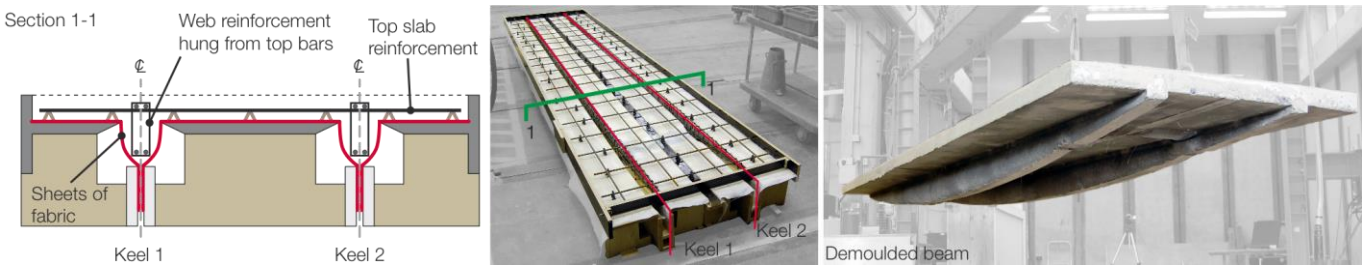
Double keel mould (l), construction (centre) and resulting beam (r).
